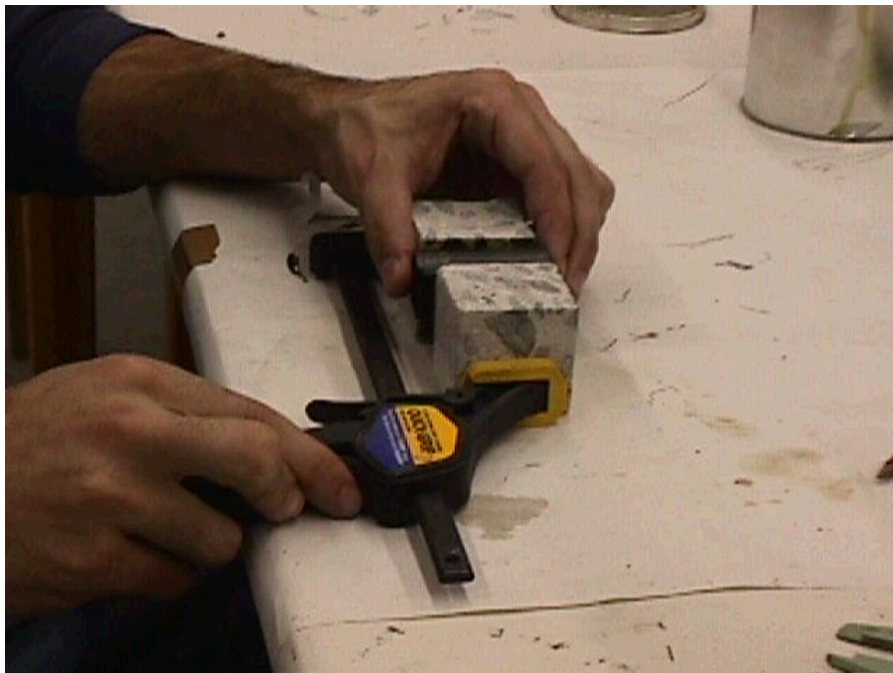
Compressing the preformed neoprene sealant between the concrete cubes
